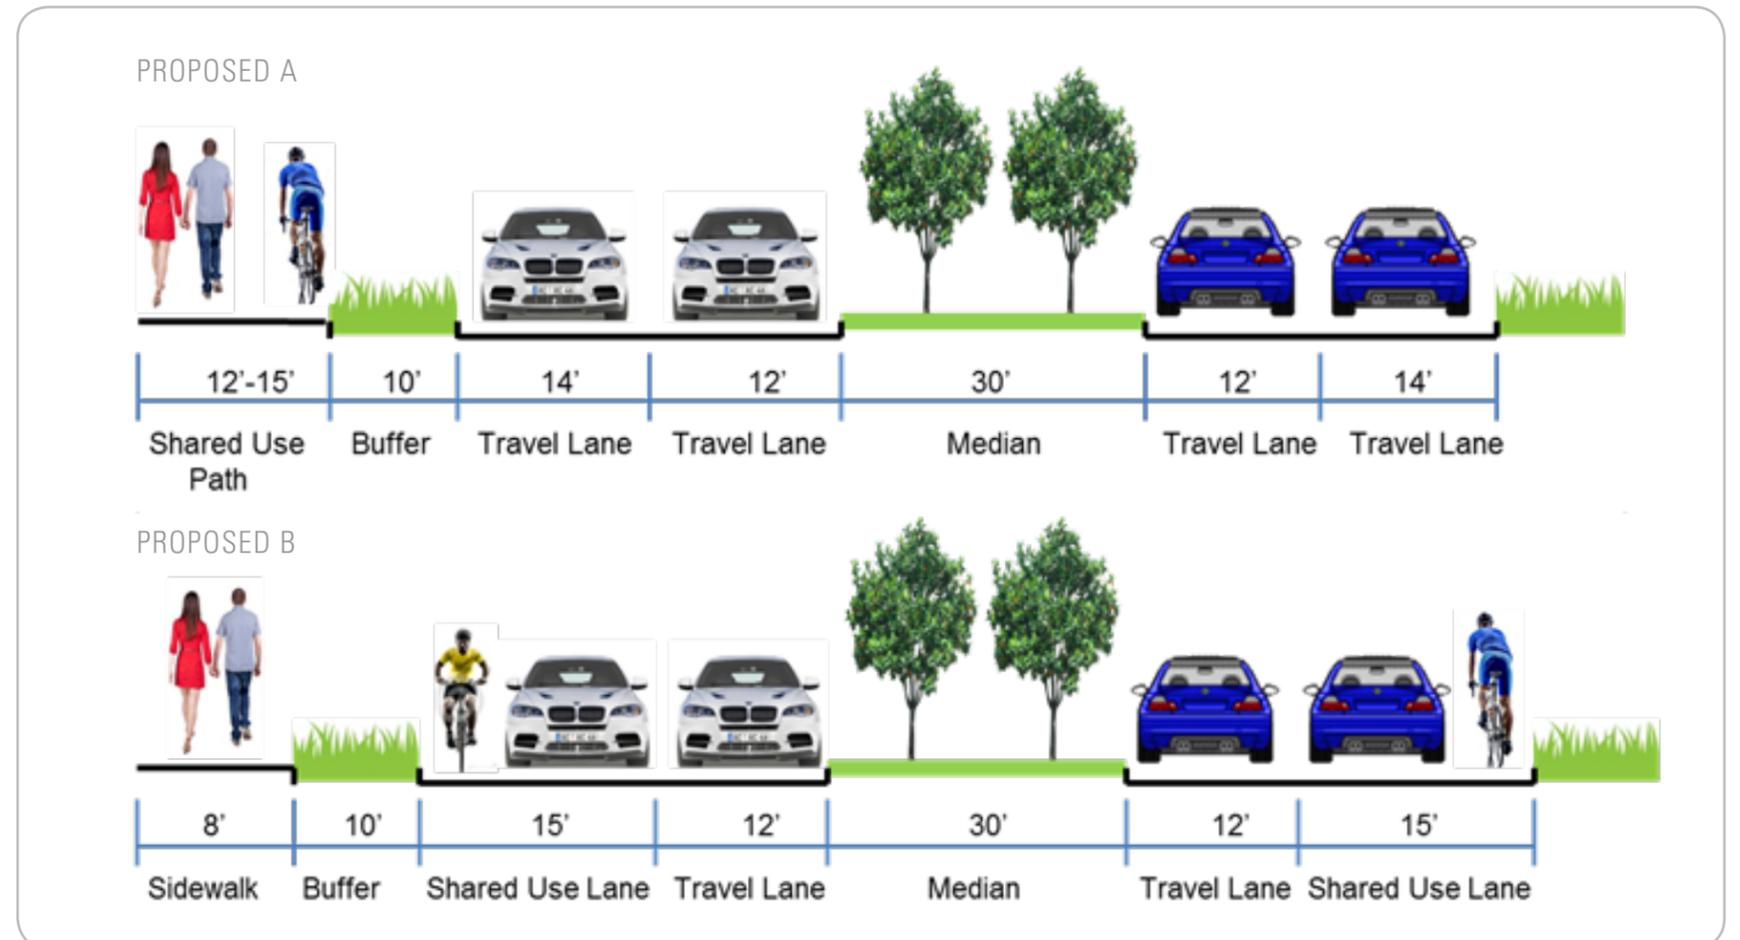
Bicycle/Pedestrian Townsen Road - Possible Treatments (New Facility)
